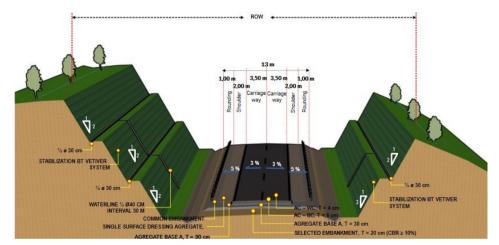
Cross-section imagery of the road design on sloping excavation surface
